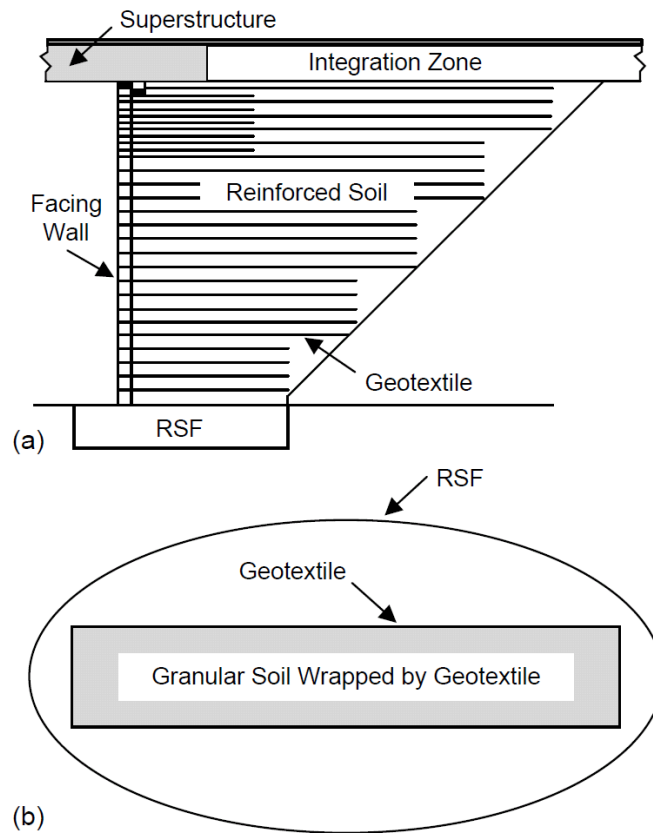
GRS-IBS structure: (a) Typical section view through a GRS bridge abutment, and (b) Reinforced soil foundation (RSF).
